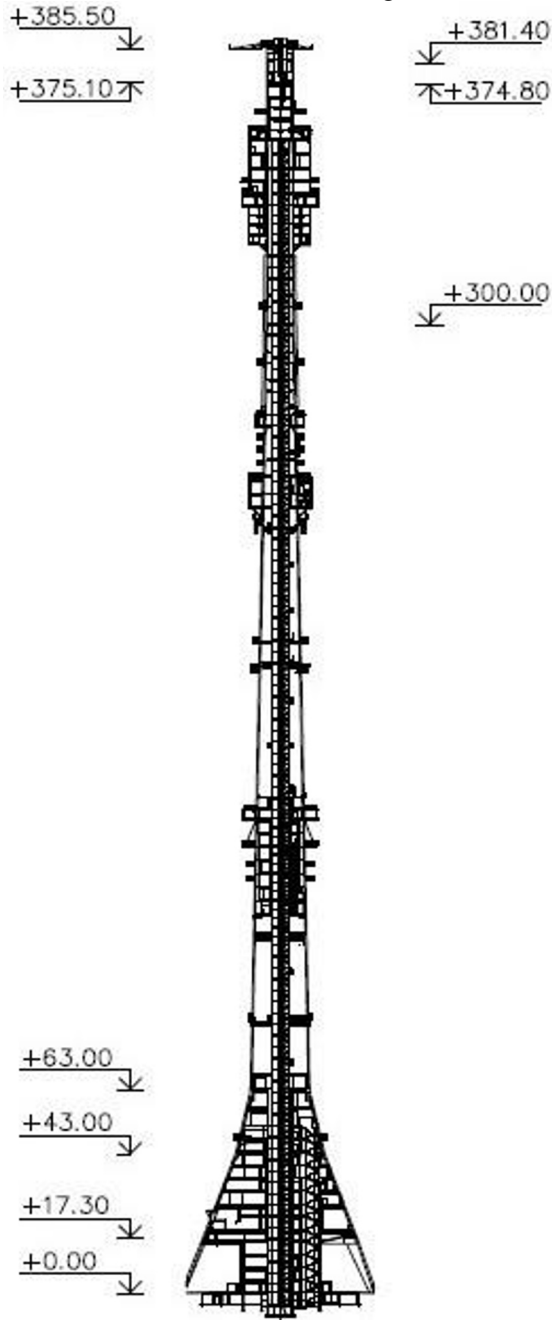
Section of the reinforced concrete part of the Ostankino TV tower.
